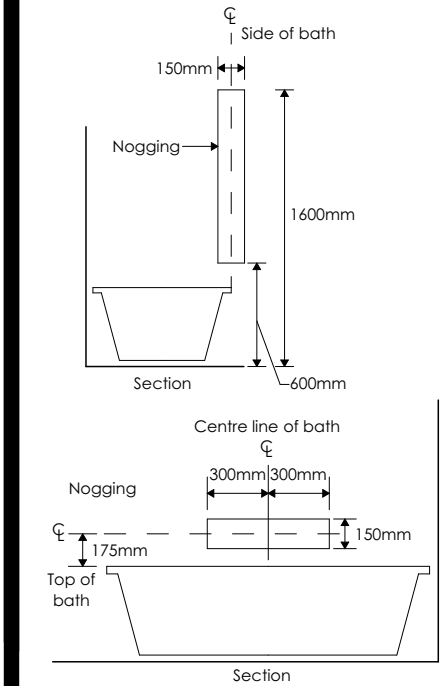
BELOW LOCATION OF SHEETING FOR WALLS SURROUNDING A BATH
